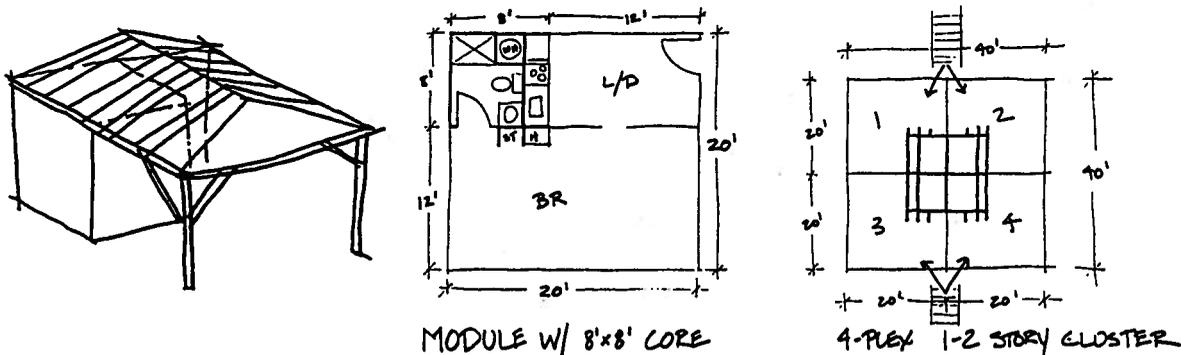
Stick Construction with Core Unit. In backyards, vacant lots, parking lots
